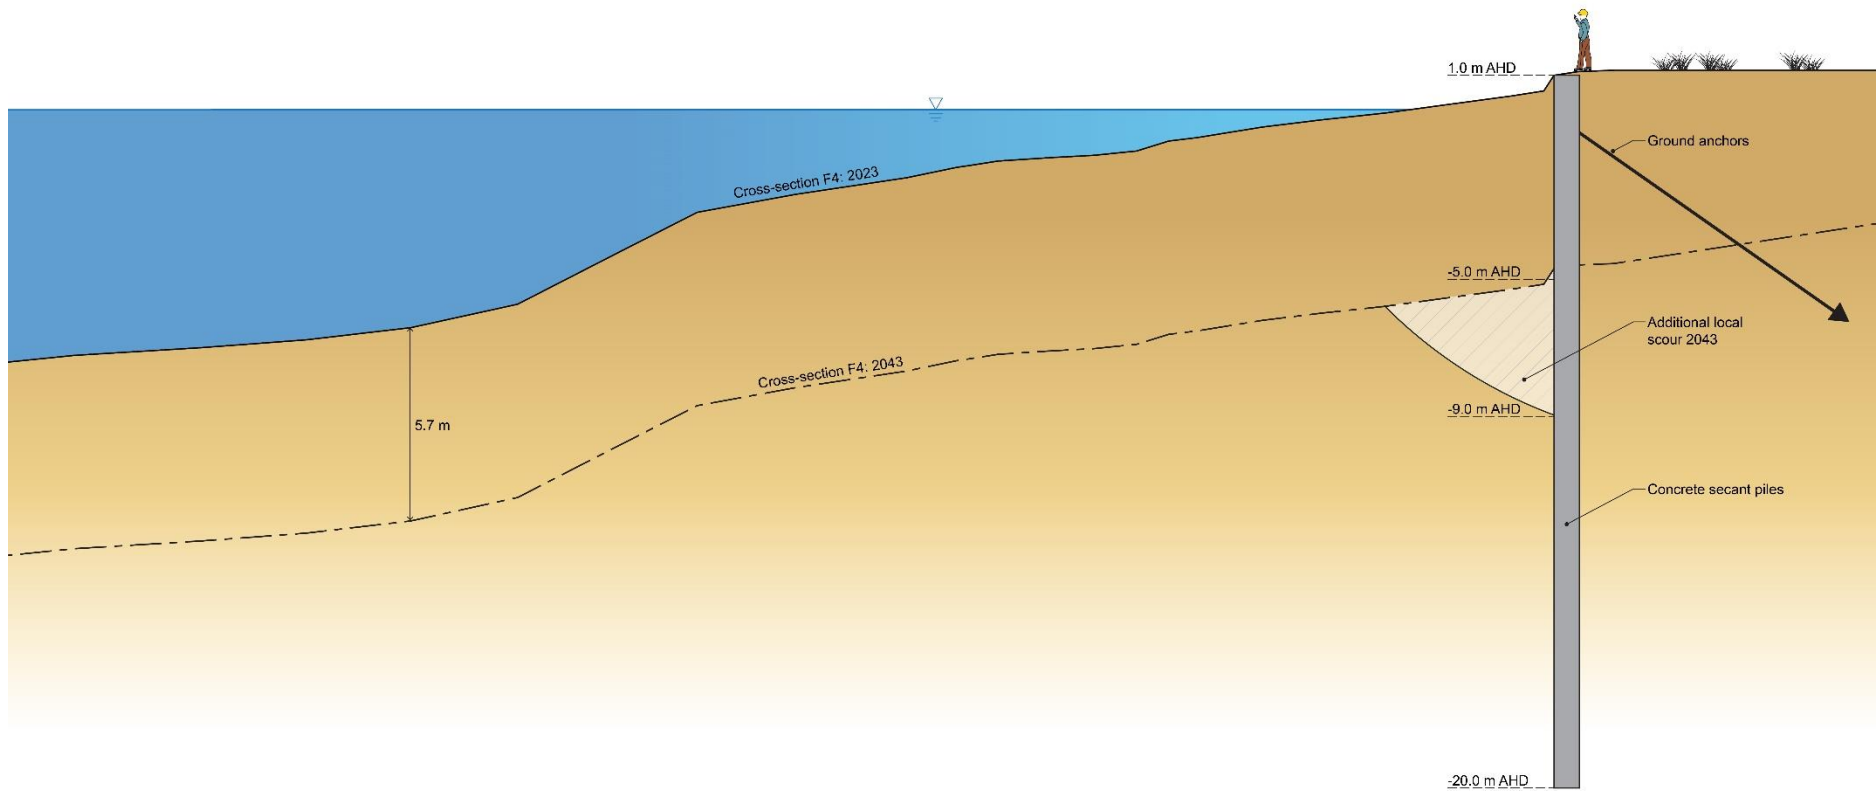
Example vertical concrete secant pile revetment (Kingscliff, NSW)
